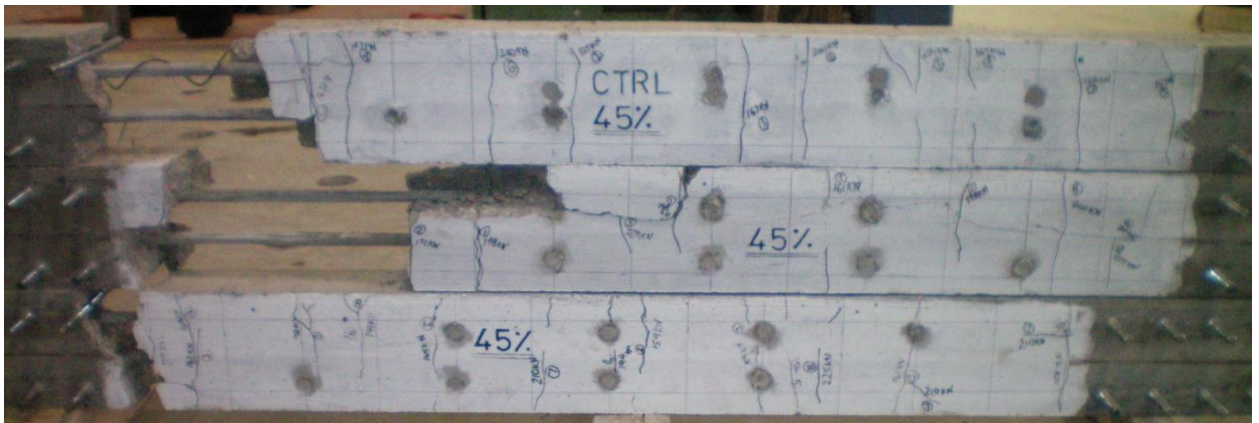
Crack Pattern and Mode of failure of Straps Prestressed at 45%-B
